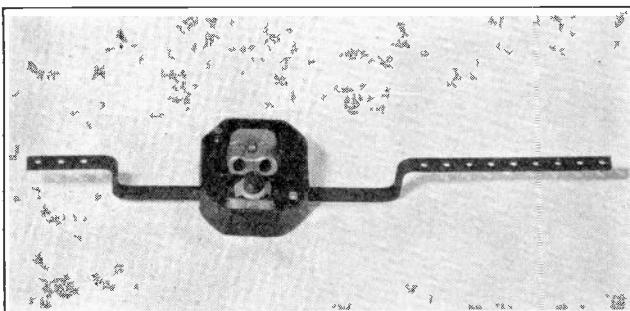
This photo shows the inside of a common outlet box with fixture stud and "loom" clamps in place, and also the bar used for mounting the box.
